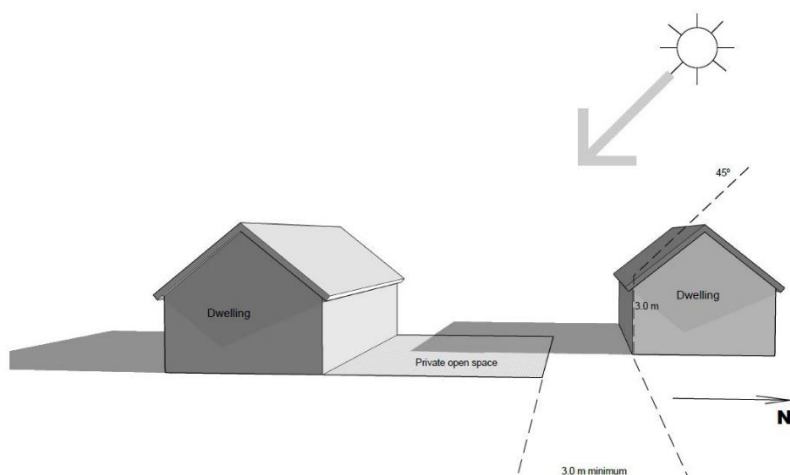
Separation from the private open space of another dwelling on the same site as required by clause 10.4.4 A1(a)
